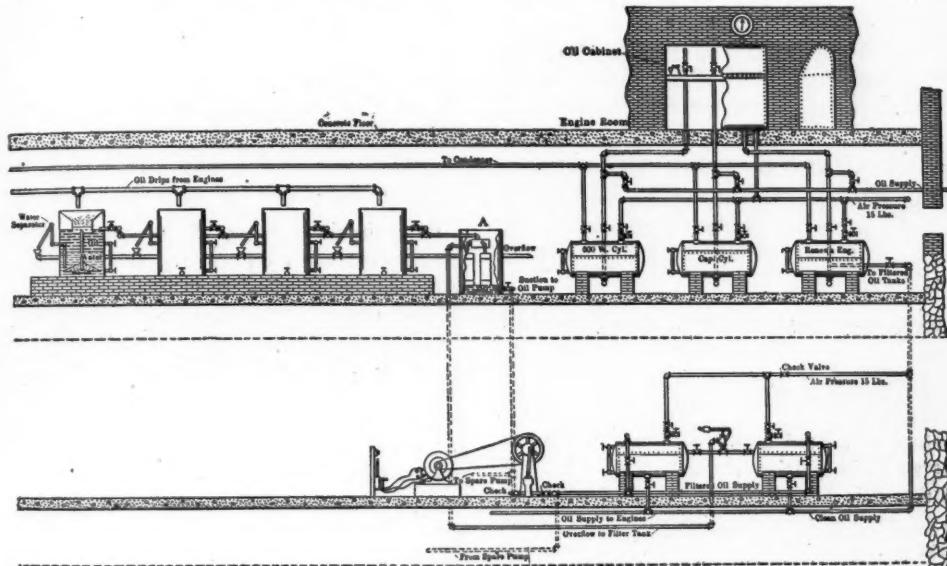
VERTICAL SECTION SHOWING OILING SYSTEM.
